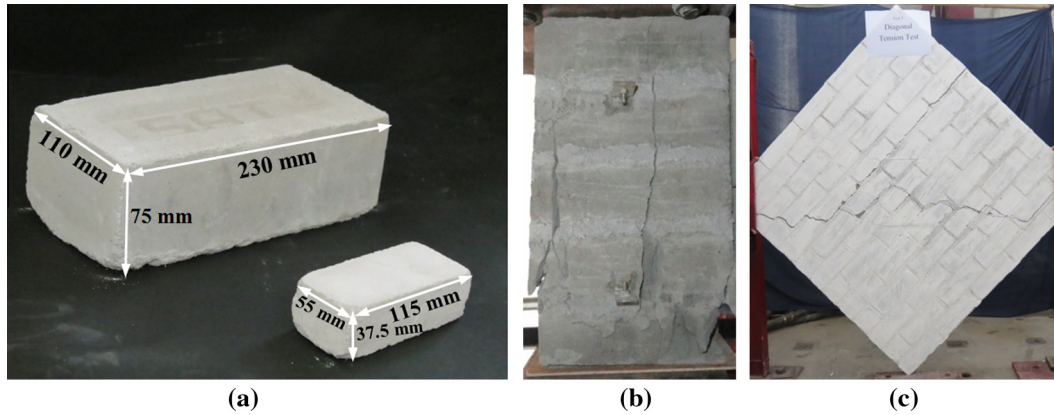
(a) Description of full-scale and half-scale bricks; failure of: (b) masonry prism; and (c) masonry wallette.
